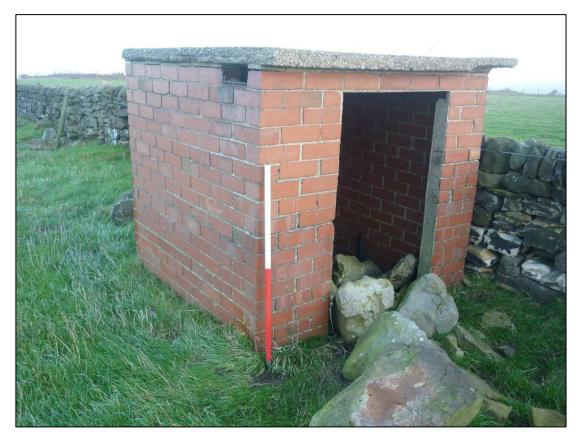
Building R5, looking E (photo 2/949, December 2011).
